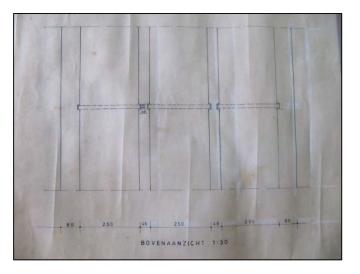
Construction drawing IKUGH, one gate Figure 42: Construction drawing IKUGH, plan view
